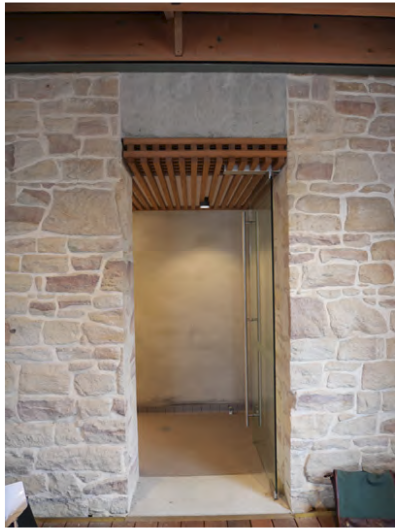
View of the modern door opening cut through the original sandstone walls to the original building connecting to the new kitchen wing to the west. The new kitchen wing was constructed in 2015.
